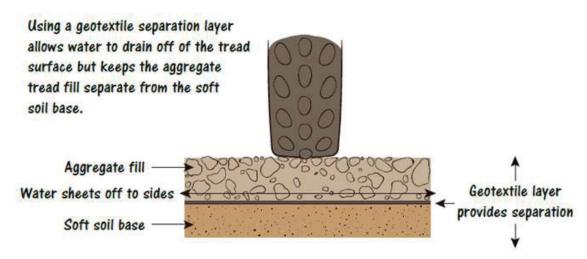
Geotextile Layer Cross Section adopted from NOHVCC
